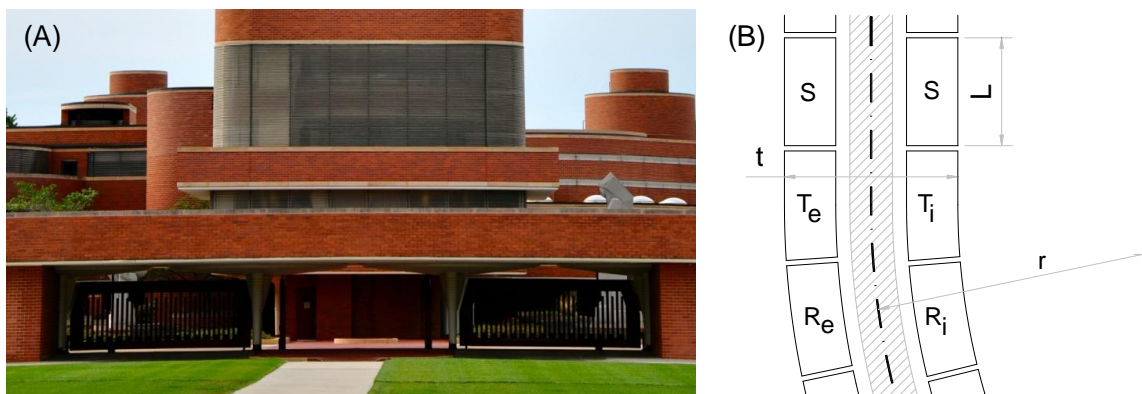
(A) Johnson Wax Building, Frank Lloyd Wright, research tower (image credit: Wei Ping Teoh), (B) Five brick types needed to achieve straight wall transitioning to curved wall of a given radius (r).
